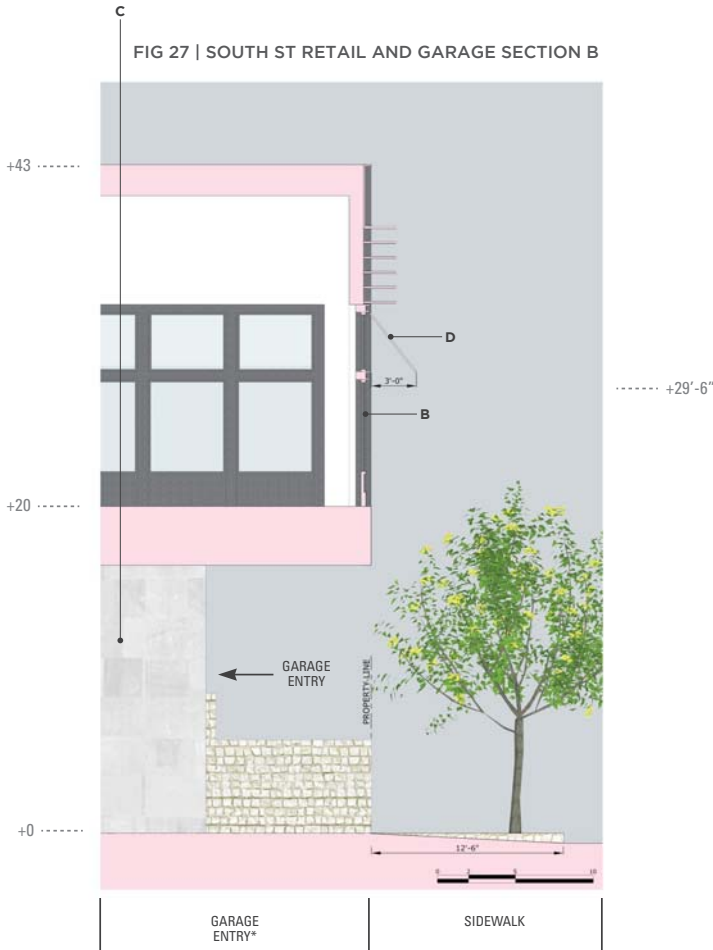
| SOUTH ST RETAIL AND GARAGE SECTION B
